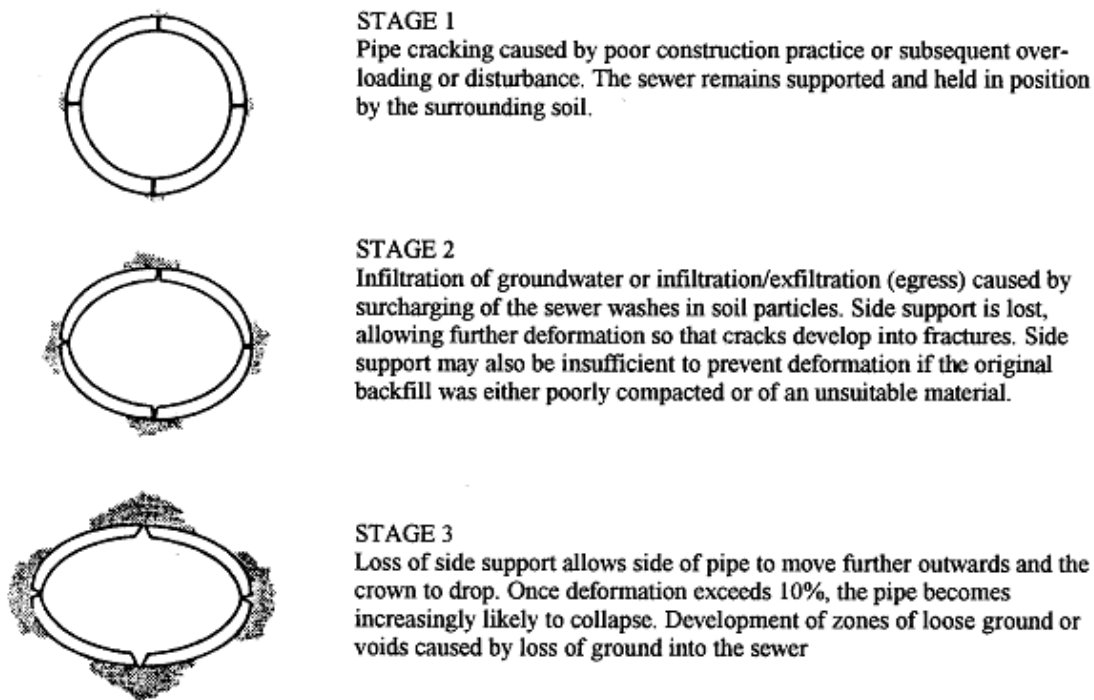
Typical progress in failure of a rigid sewer pipe
